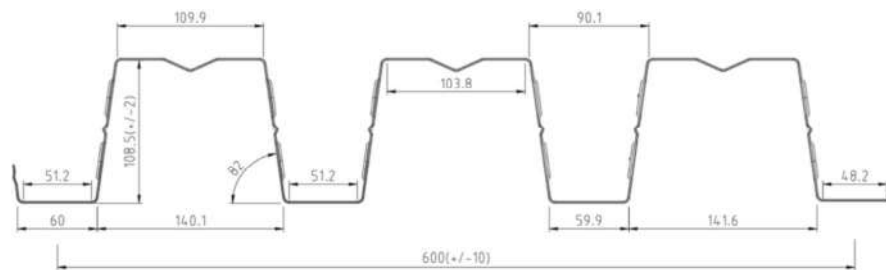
Cross-section geometry of the Steel Sheets (referred to as SG110-600)
